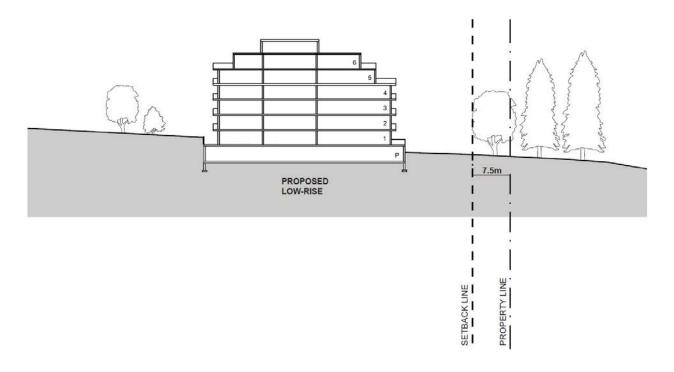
Section through 6-storey low-rise building looking Northeast
